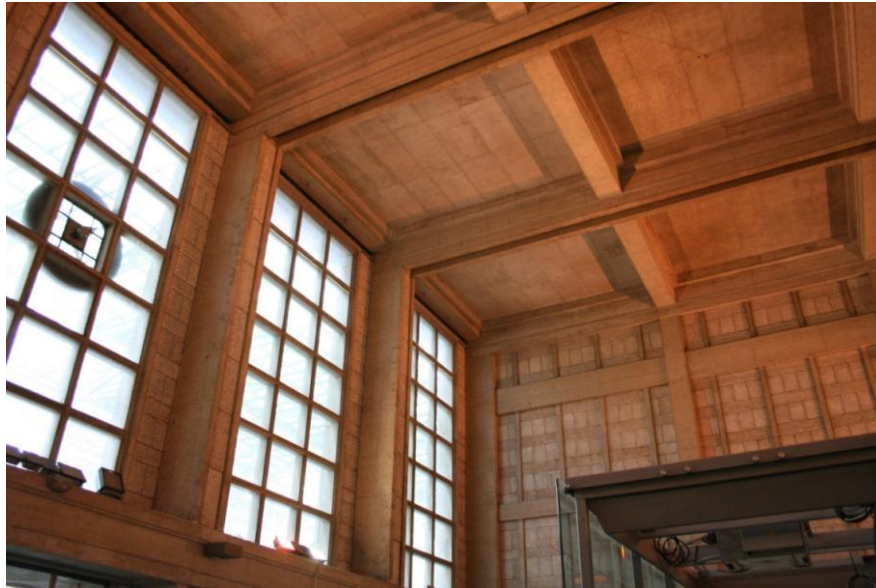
Detail of the column and beam structural system at Amiens train station, France. The beam system is made up of two smaller beams running parallel to each other.
